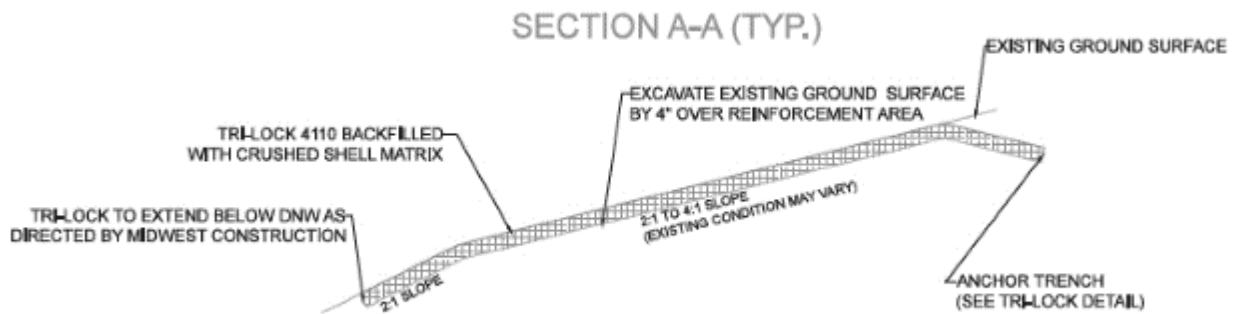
Typical slope placement specifications for Tri-Lock Blocks.
